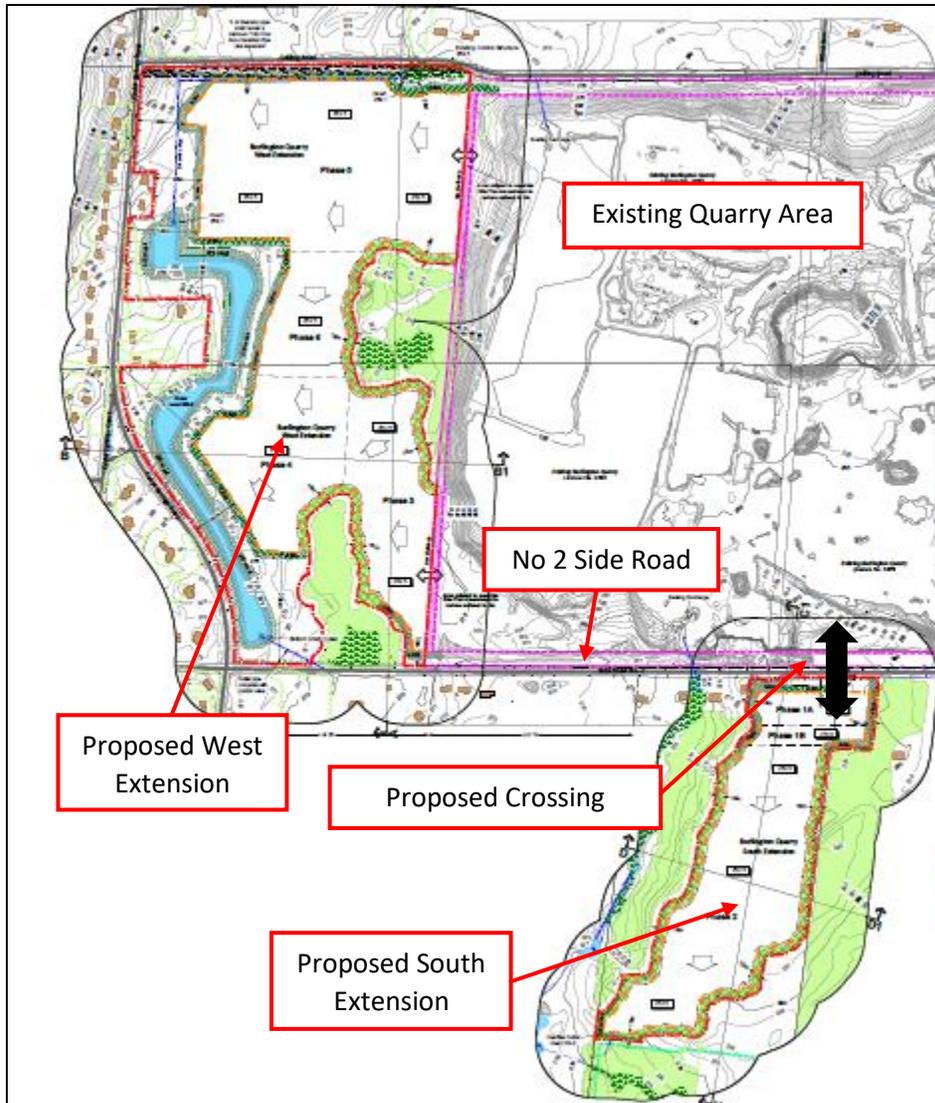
Site plan showing the existing quarry and proposed extensions and crossing (MHBC)².
